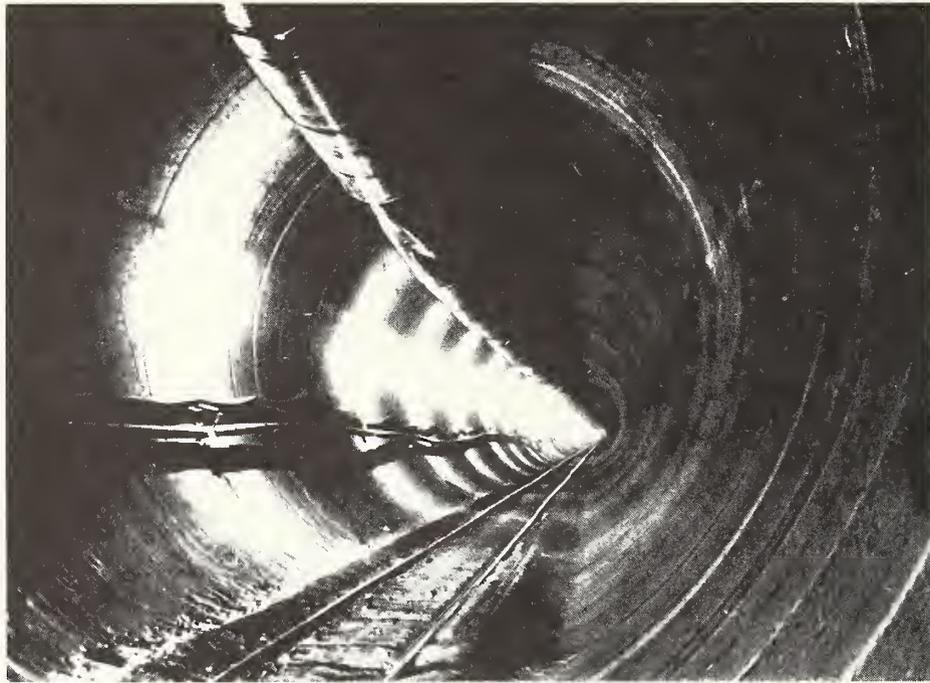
Tunnel Bored with a Tunneling Machine Equipped with Roller Bits
